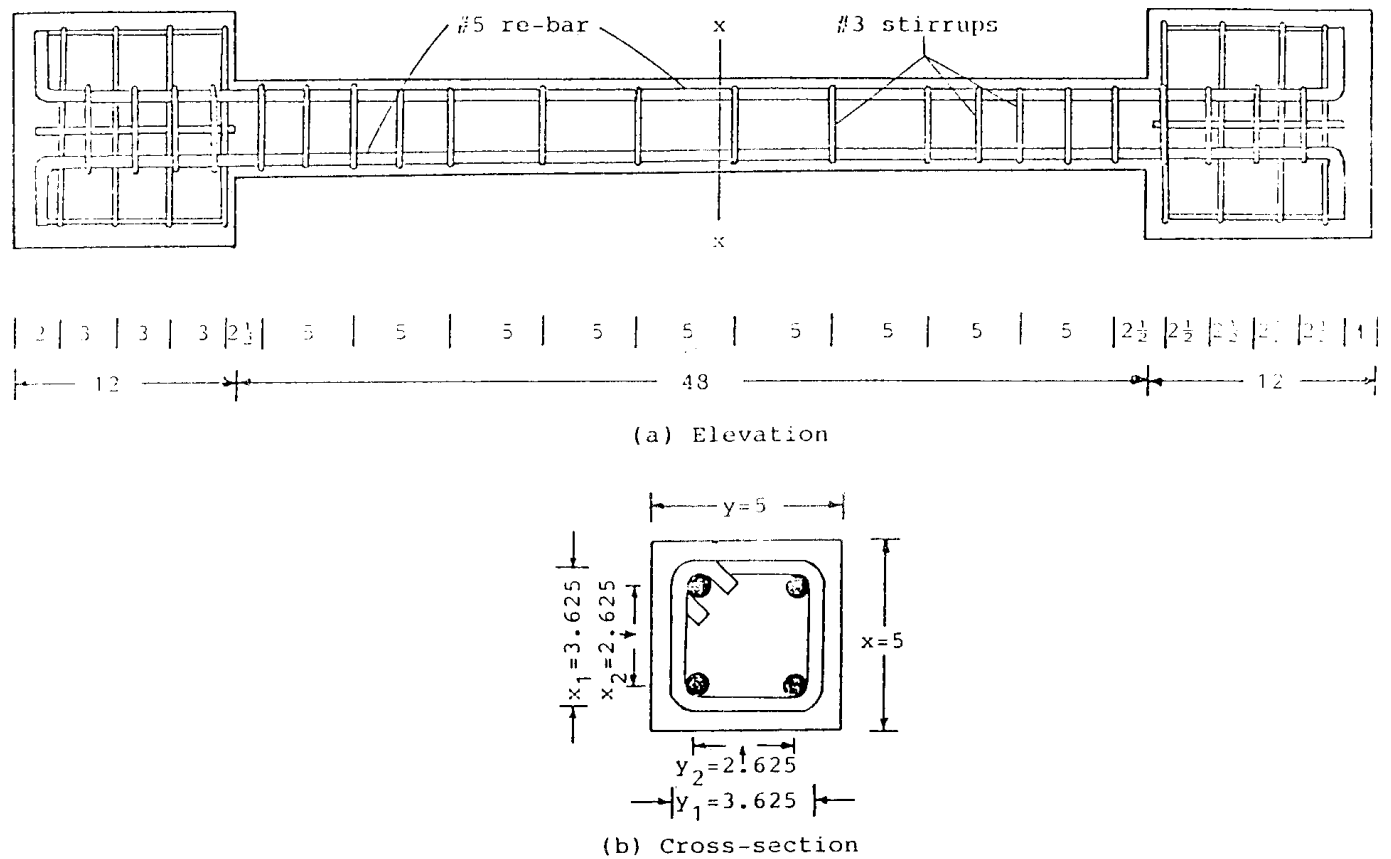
Reinforcement details of square column (all dimensions are in inches)
